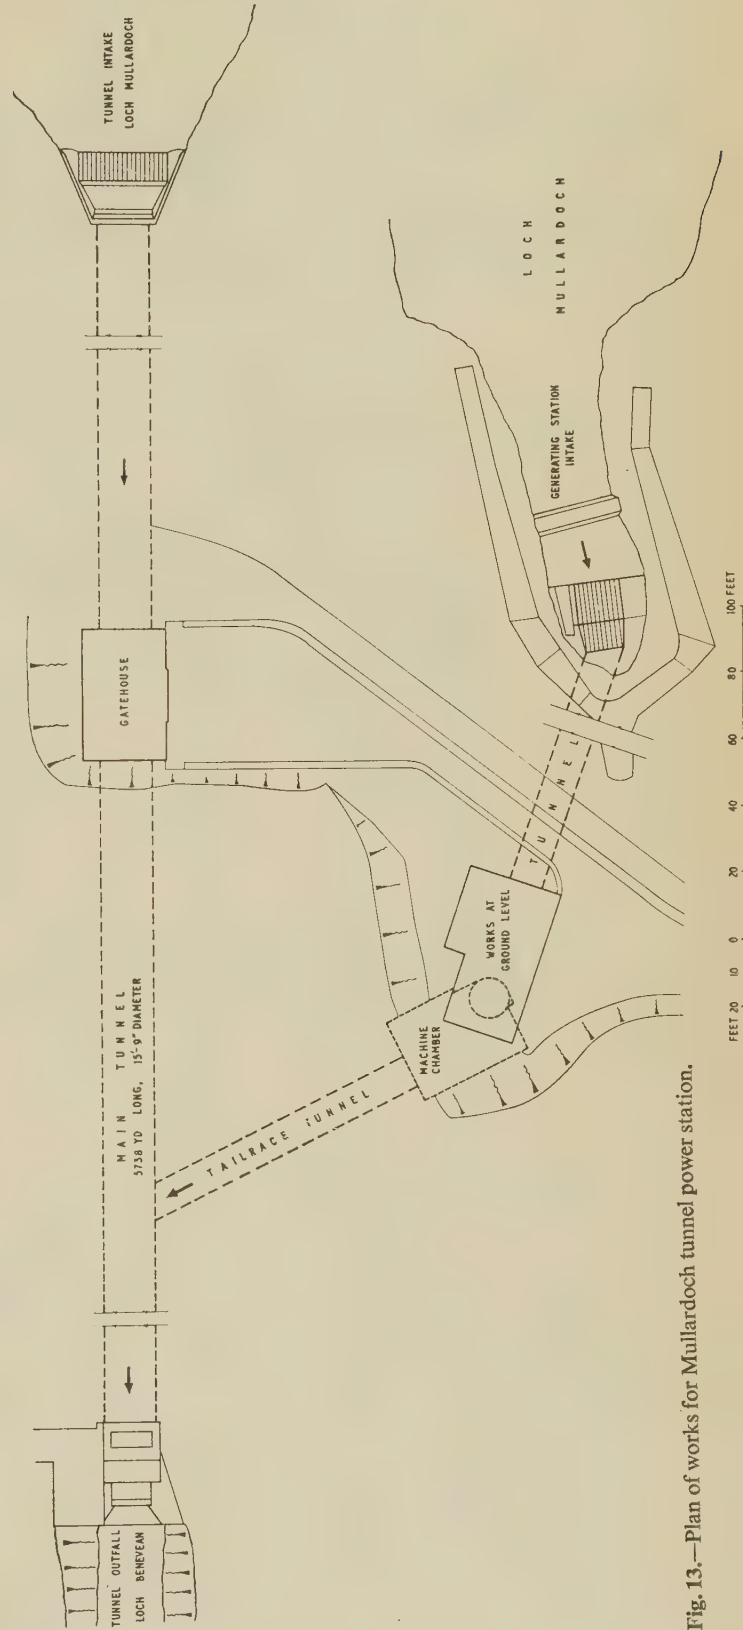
Plan of works for Mullardoch tunnel power station.
